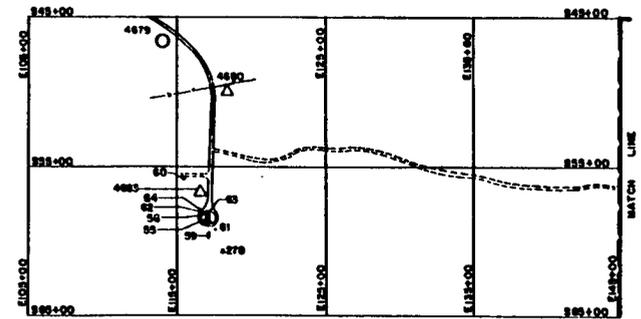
Structure Location Plan for TA-36 - Kappa Site (1983 Drawing from the LANL Technical Area Structure Location Plans)
